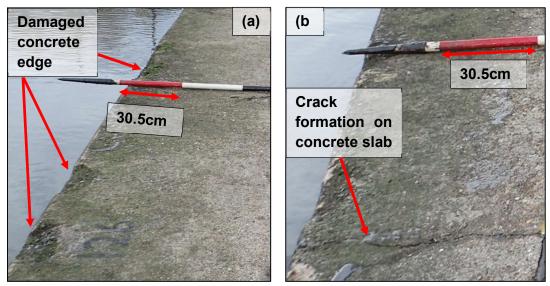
(a) Damaged edge and (b) crack of concrete slab for Section 1 - Sheet Pile Wall
